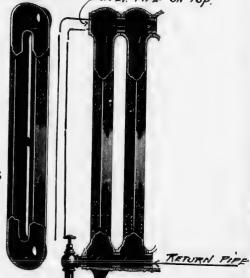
Sectional View of Gold Pin-INDIRECT.
